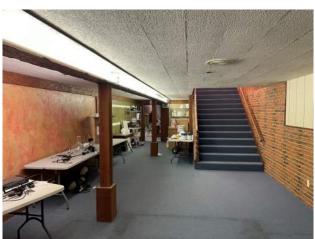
CMU foundation wall visible from basement of 215 W. Lincolnway.
